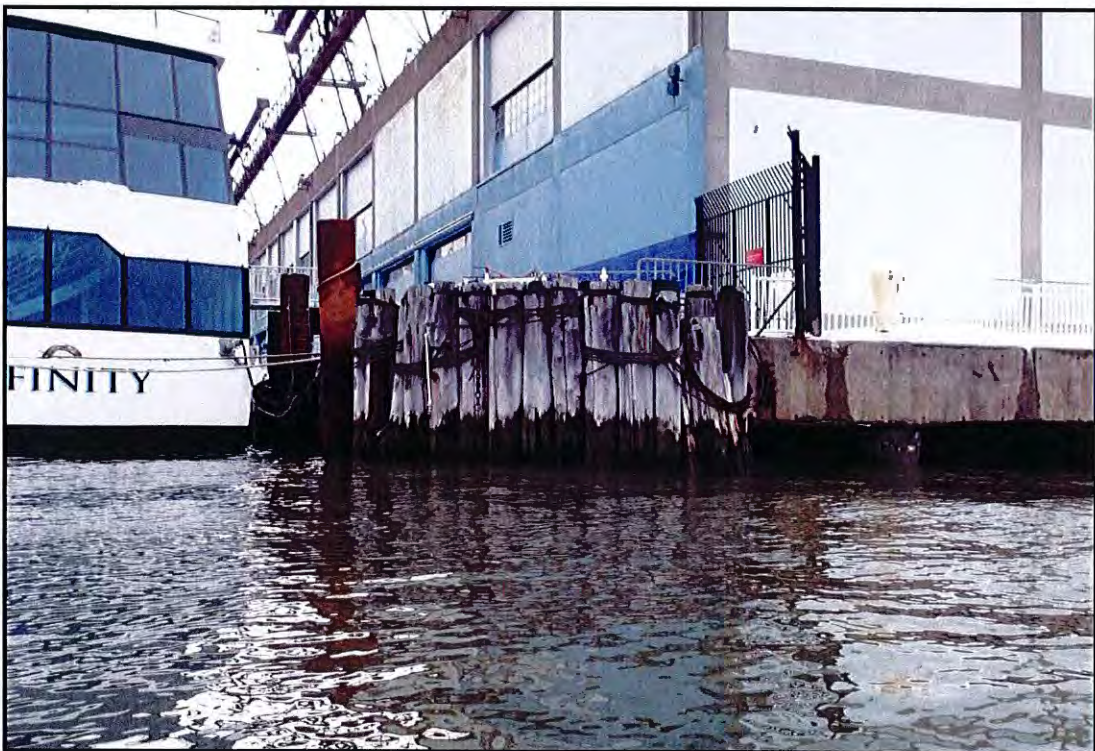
View of timber fender pile cluster located at the northwest corner of the Pier Shed. Note steel fender piles with full coverage coating loss.
